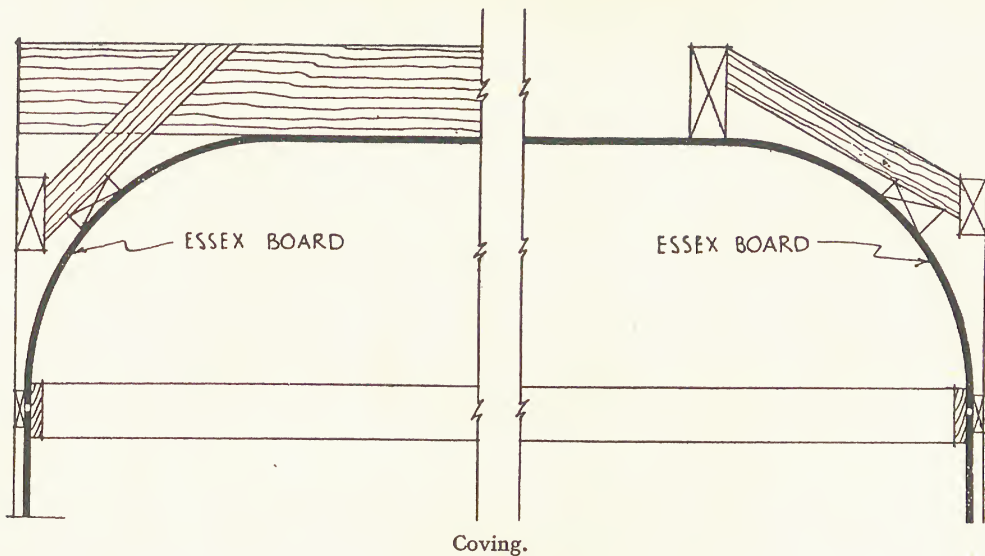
Methods advised in forming ceilings with Essex wall-board.
